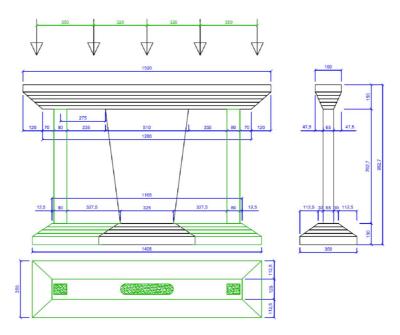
Drawing of solution PB for piers (annotations in cm)
